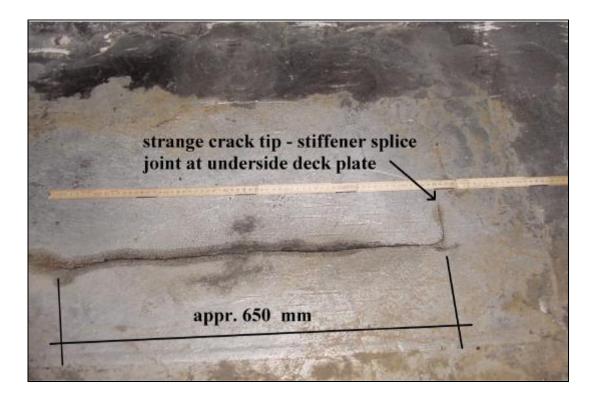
Deck crack after the removal of the asphalt layer deck
